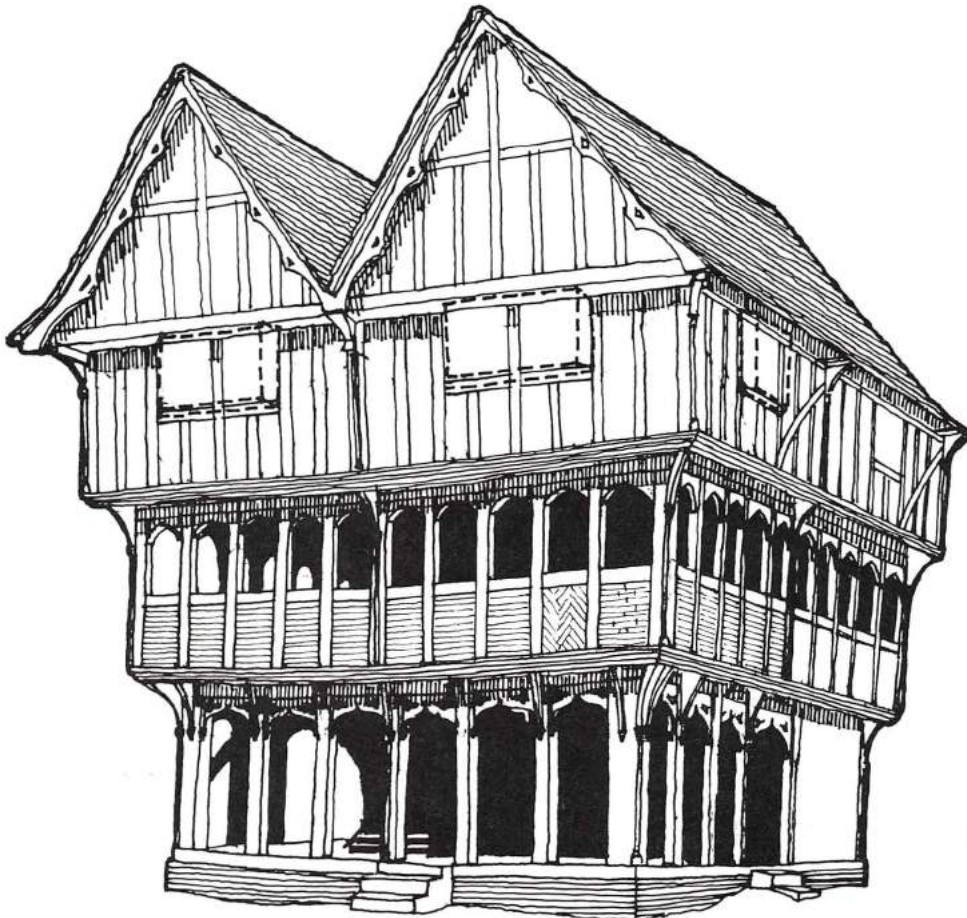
Reconstruction of Thaxted 'Guildhall' (not to scale).
